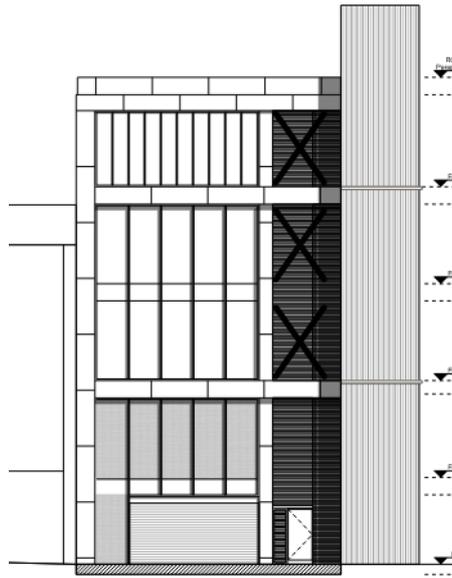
Western Elevation – Proposed frontage to 184 York Way
